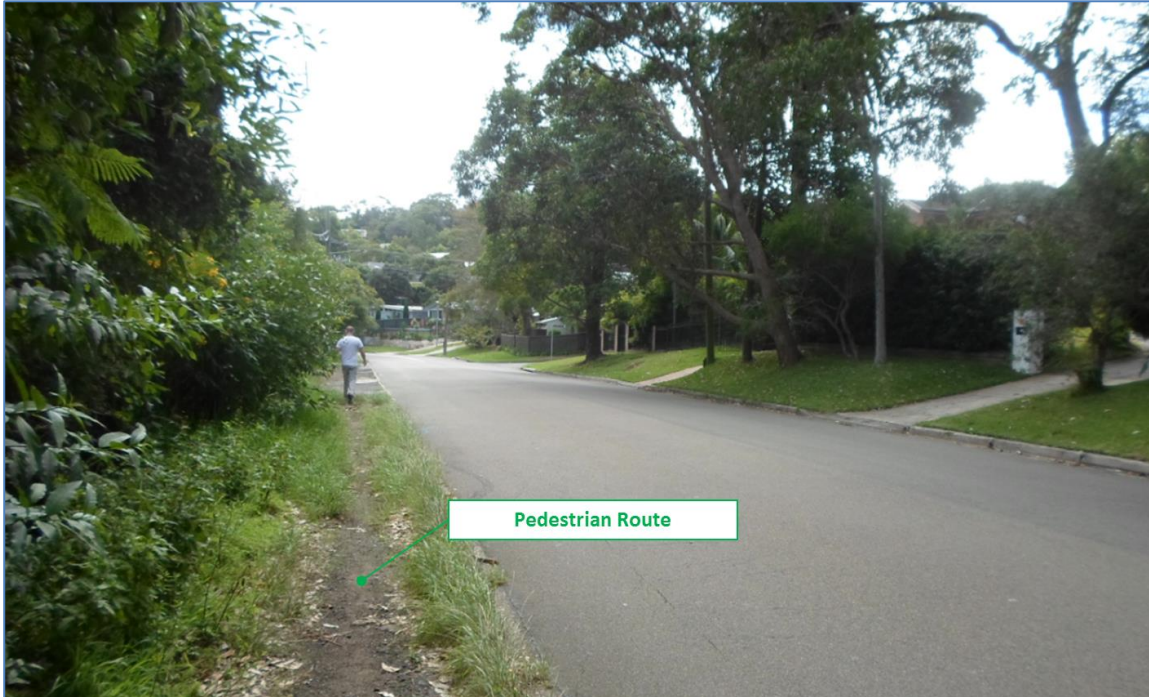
Pedestrian route on the southern side of Warriewood Road
